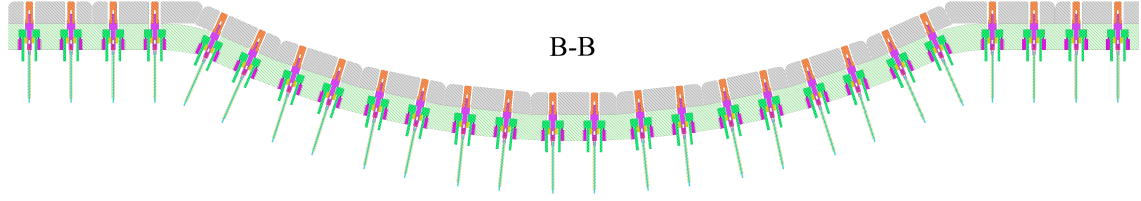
Cutaway view of B-B with cut face shown in Fig. 1 (c).
